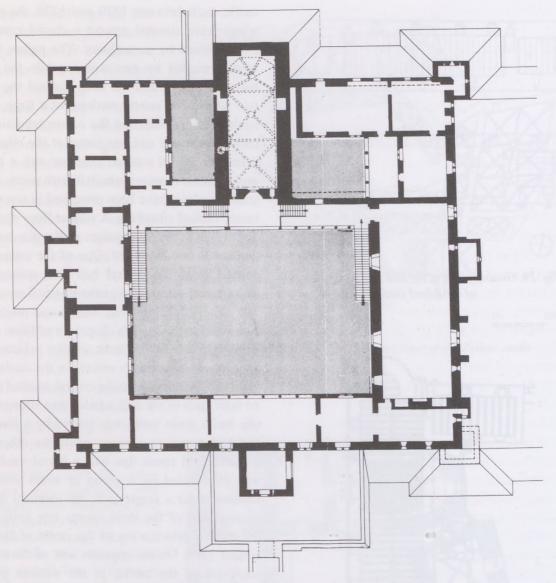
Ground plan of the upper floor of the castle of Perpignan
